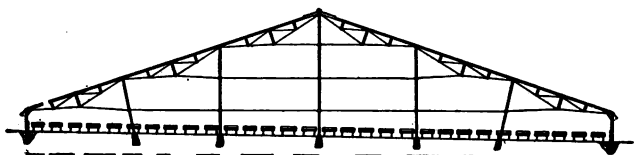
Section of combination truss-frame greenhouse, 172 feet wide
